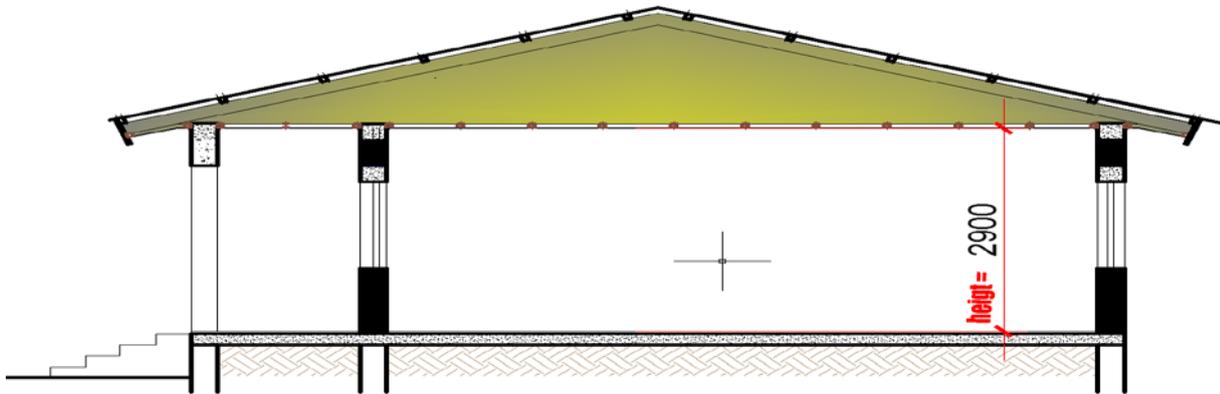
Cross section showing the floor to ceiling height of a typical classroom surveyed in this study. Source. Fieldwork by author (2017).
